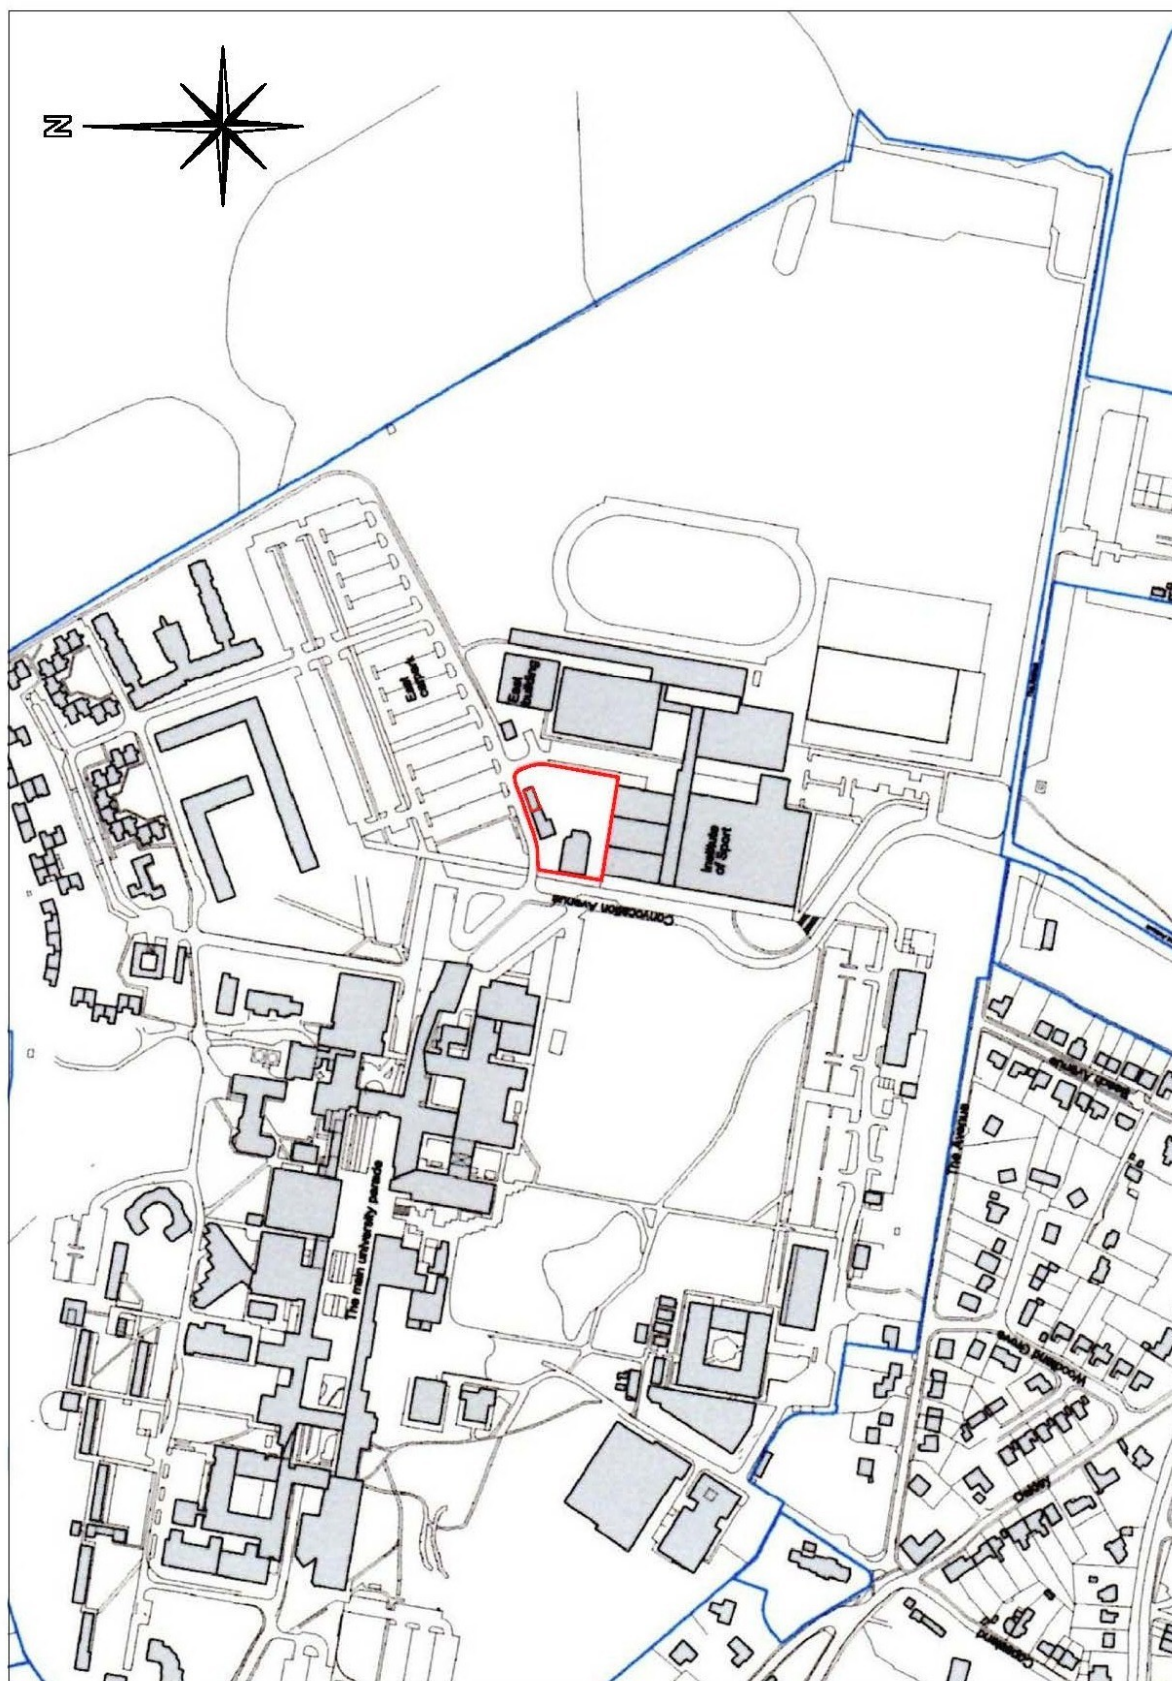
Site location plan submitted with planning application ref: 12/03069/FUL. Scale 1:2000 @ A4.
